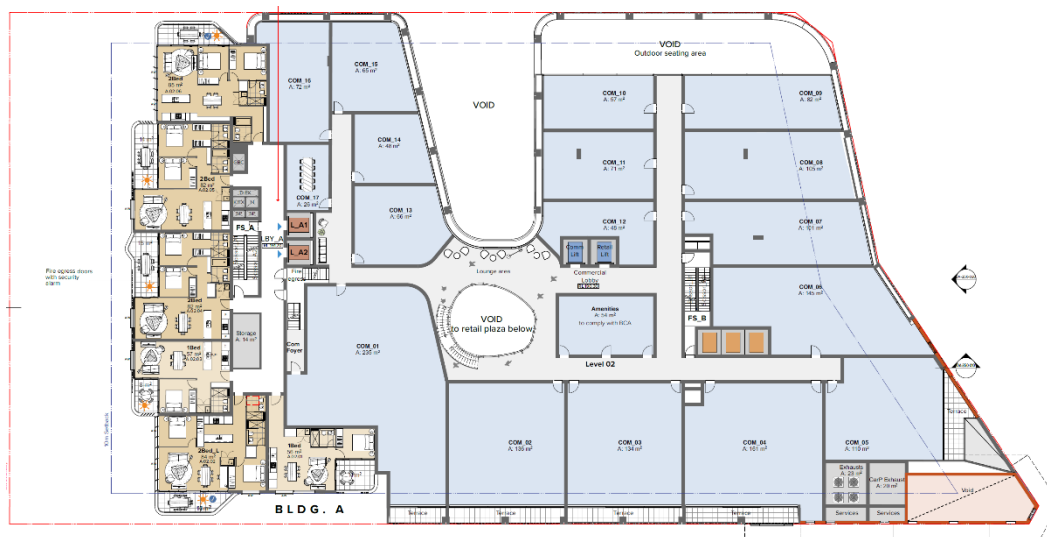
Extract of the Level 2 plan (Source: Turner Architects)
